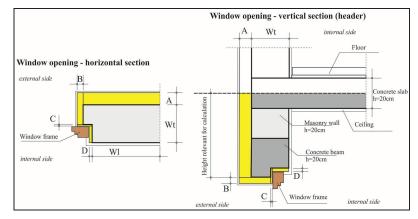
Scheme of typical horizontal and vertical section details of windows - wall connection
